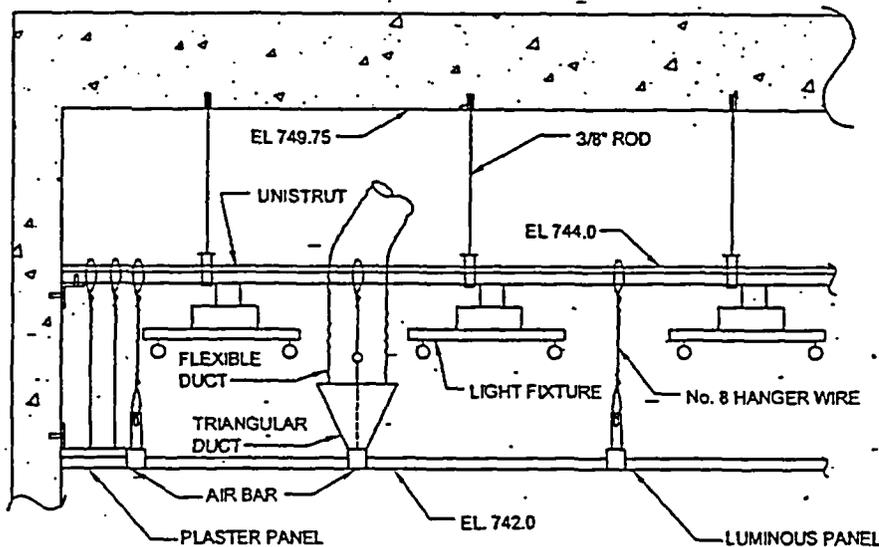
Diagram of SQN main control room suspended ceiling, looking north
